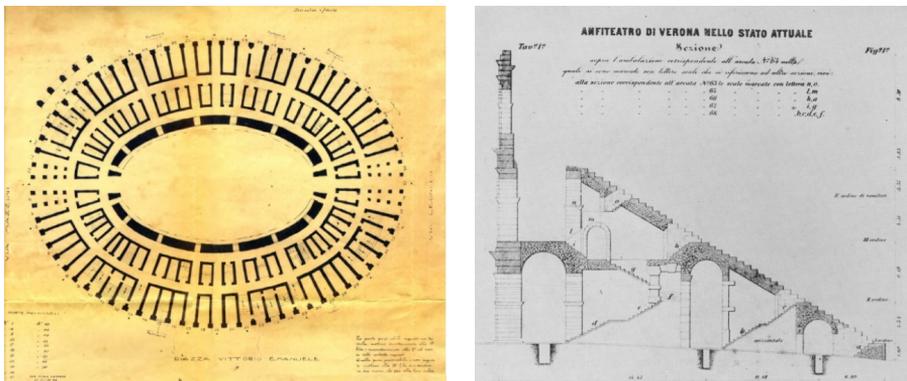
Plan of the ground floor and transverse section of the amphitheater
